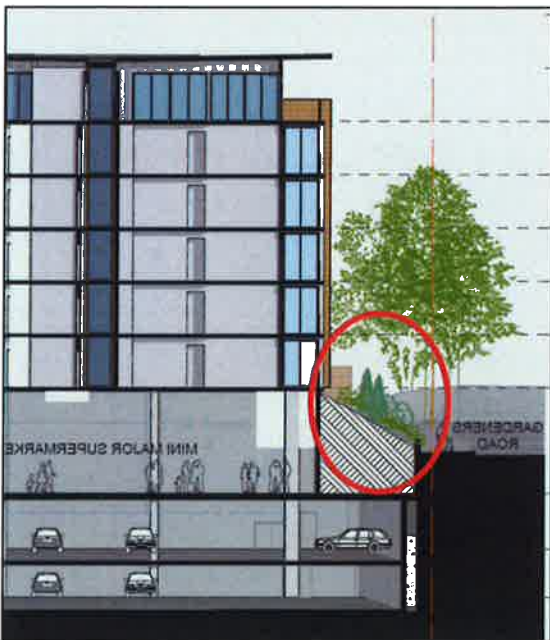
Approved Section at Gardeners Road (source: approved plans)
